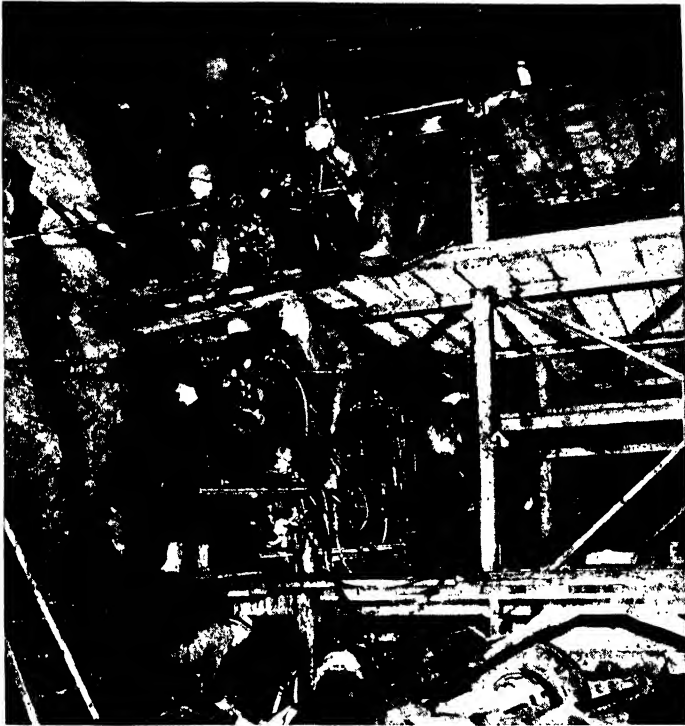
Drill carriage mounted on a truck chassis at Boulder Dam diversion tunnels, carrying 32 drills. (Courtesy of Ingersoll-Rand Co.)
